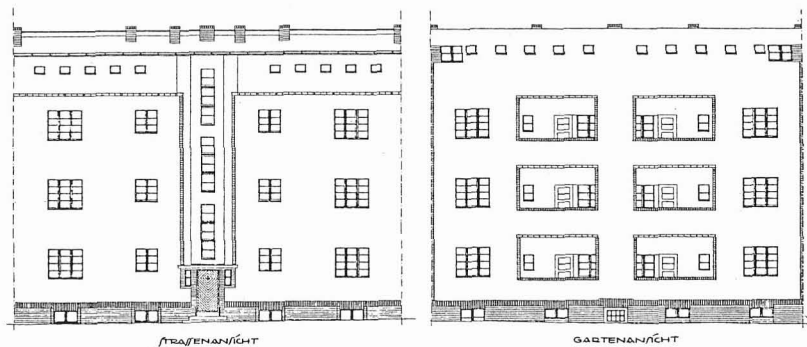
Großsiedlung* Britz, Berlin ('Horseshoe'): street and garden elevations of section for six families, Type II, by Bruno Taut.
